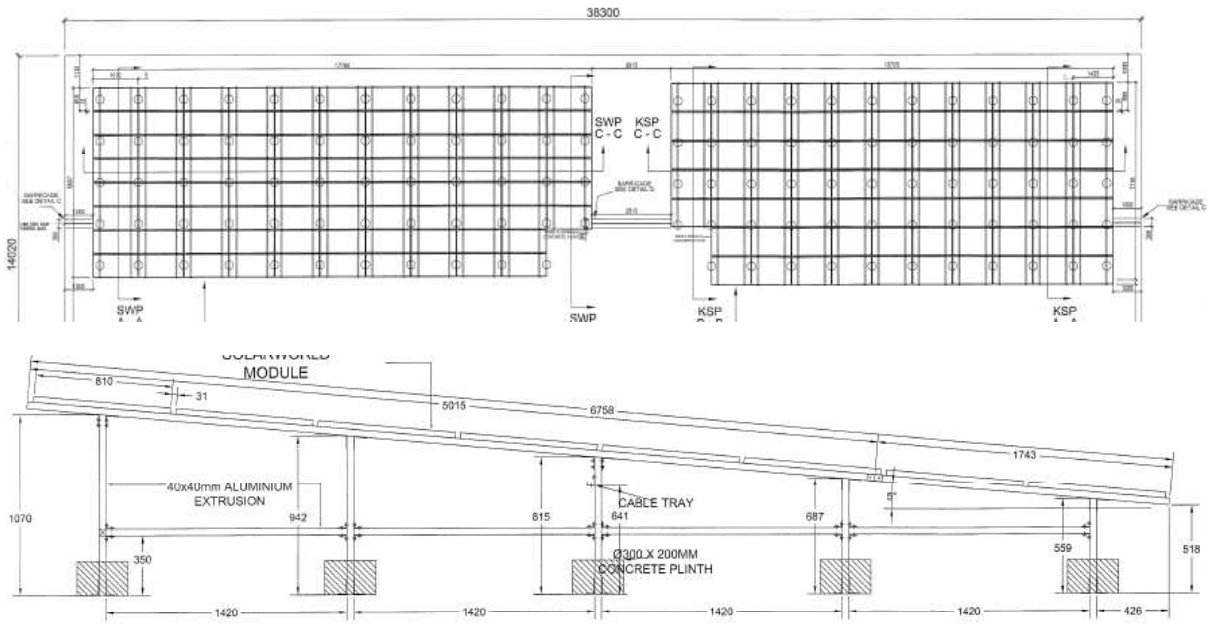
PHOTOVOLTAIC STRUCTURE LAYOUT
